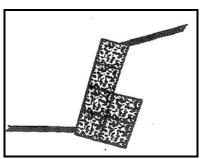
, Gabion Retaining Wall (Earth Retaining Structures – June 2008)
